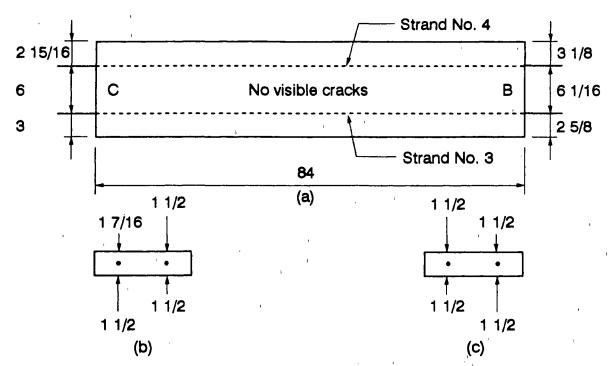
Specimen No. 4-3.0TC-5 (dimensions shown in inches):
